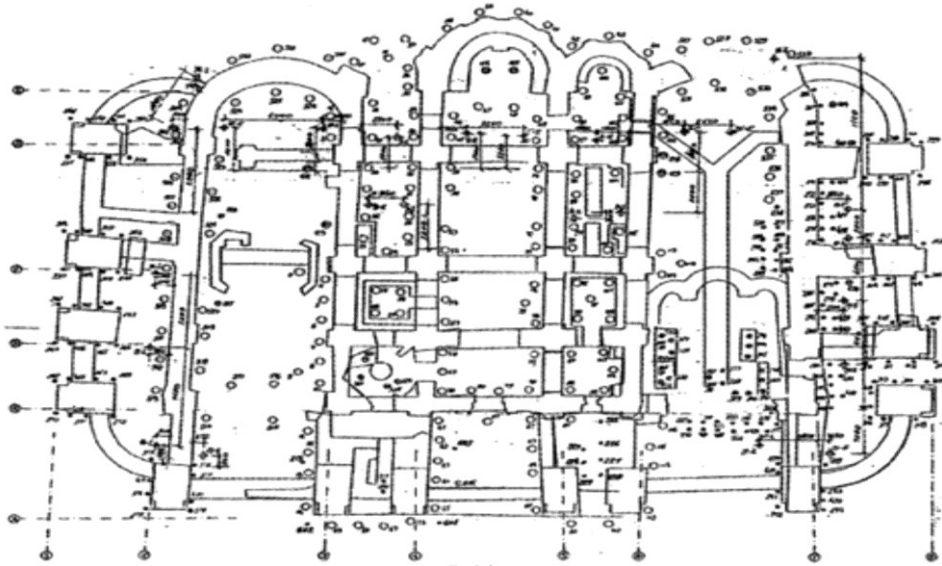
The layout of the piles in the St. Michael's Golden-Domed Cathedral. Piles (circles in plan) strengthen the original foundations and located along their lines
